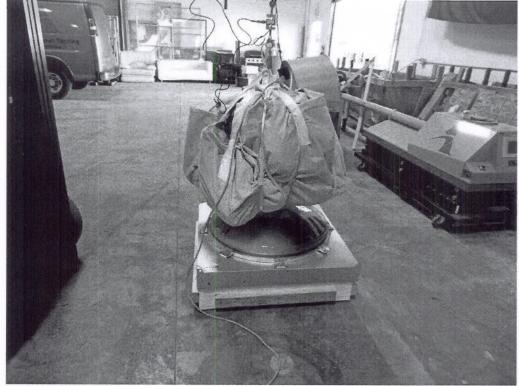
Test Specimen prior to application of the 700 lbf static load
